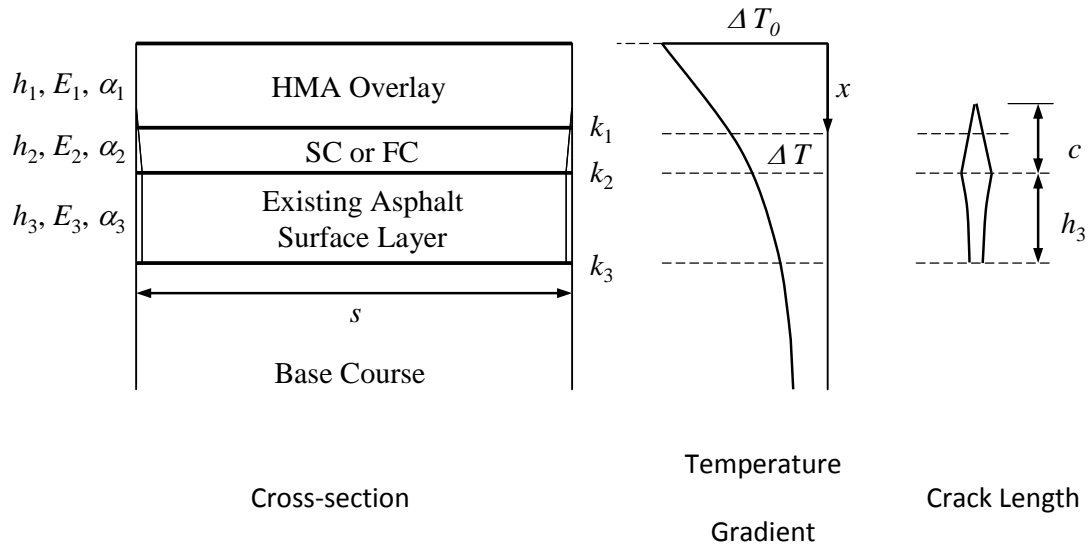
Diagram of HMA overlay on asphalt concrete pavement with SC or FC-thermal.
